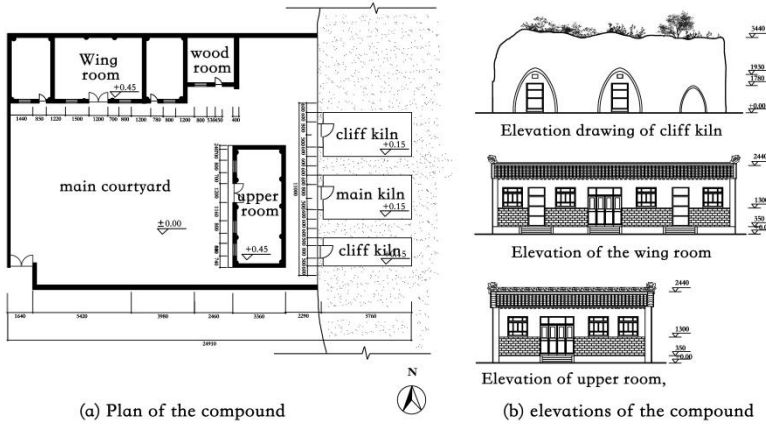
Composite courtyard plane elevation. Source: Author drawing.
